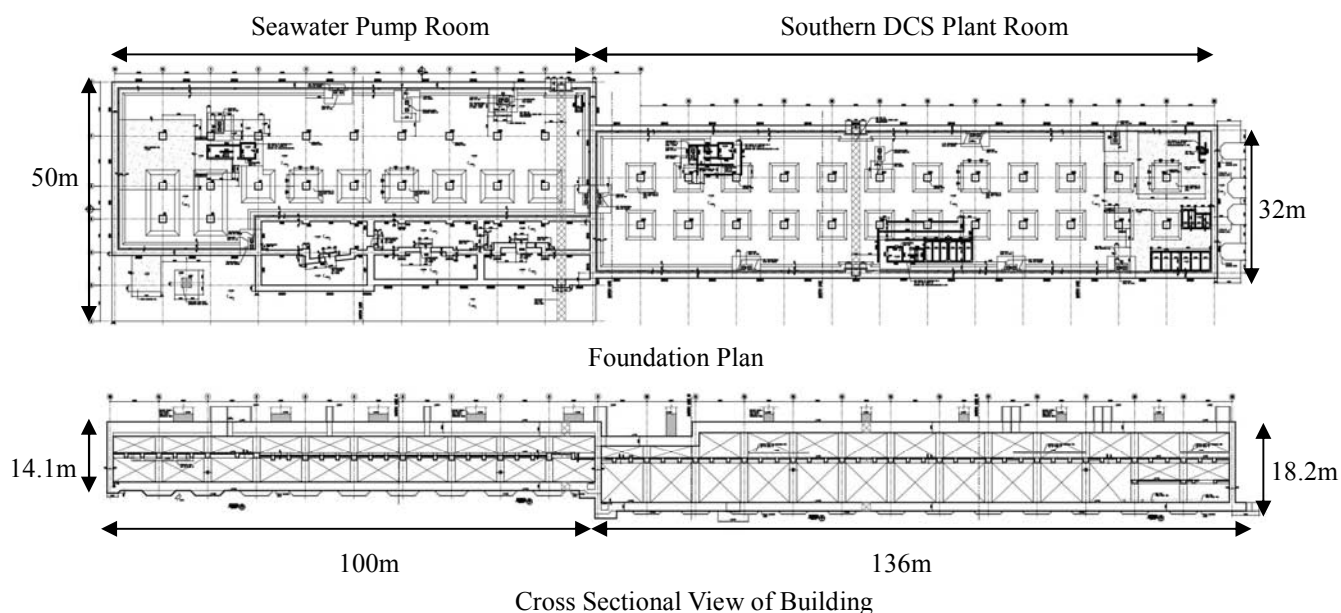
Foundation Plan and Cross Sectional View of Southern DCS Plant Room and Seawater Pump Room
